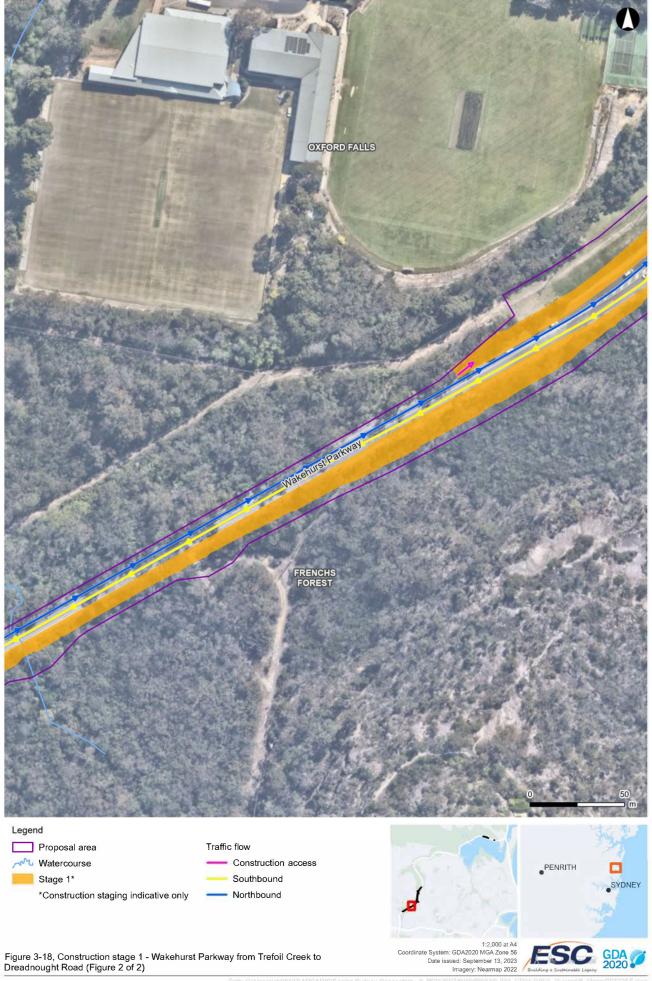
, Construction stage 1 - Wakehurst Parkway from Trefoil Creek to Dreadnought Road (Figure 2 of 2)
